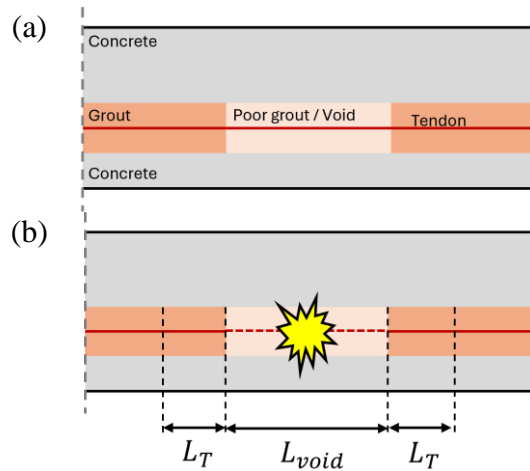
(a) Schematic representation of grouted post-tensioned element with poor grout/void; (b) Damage variables definition
